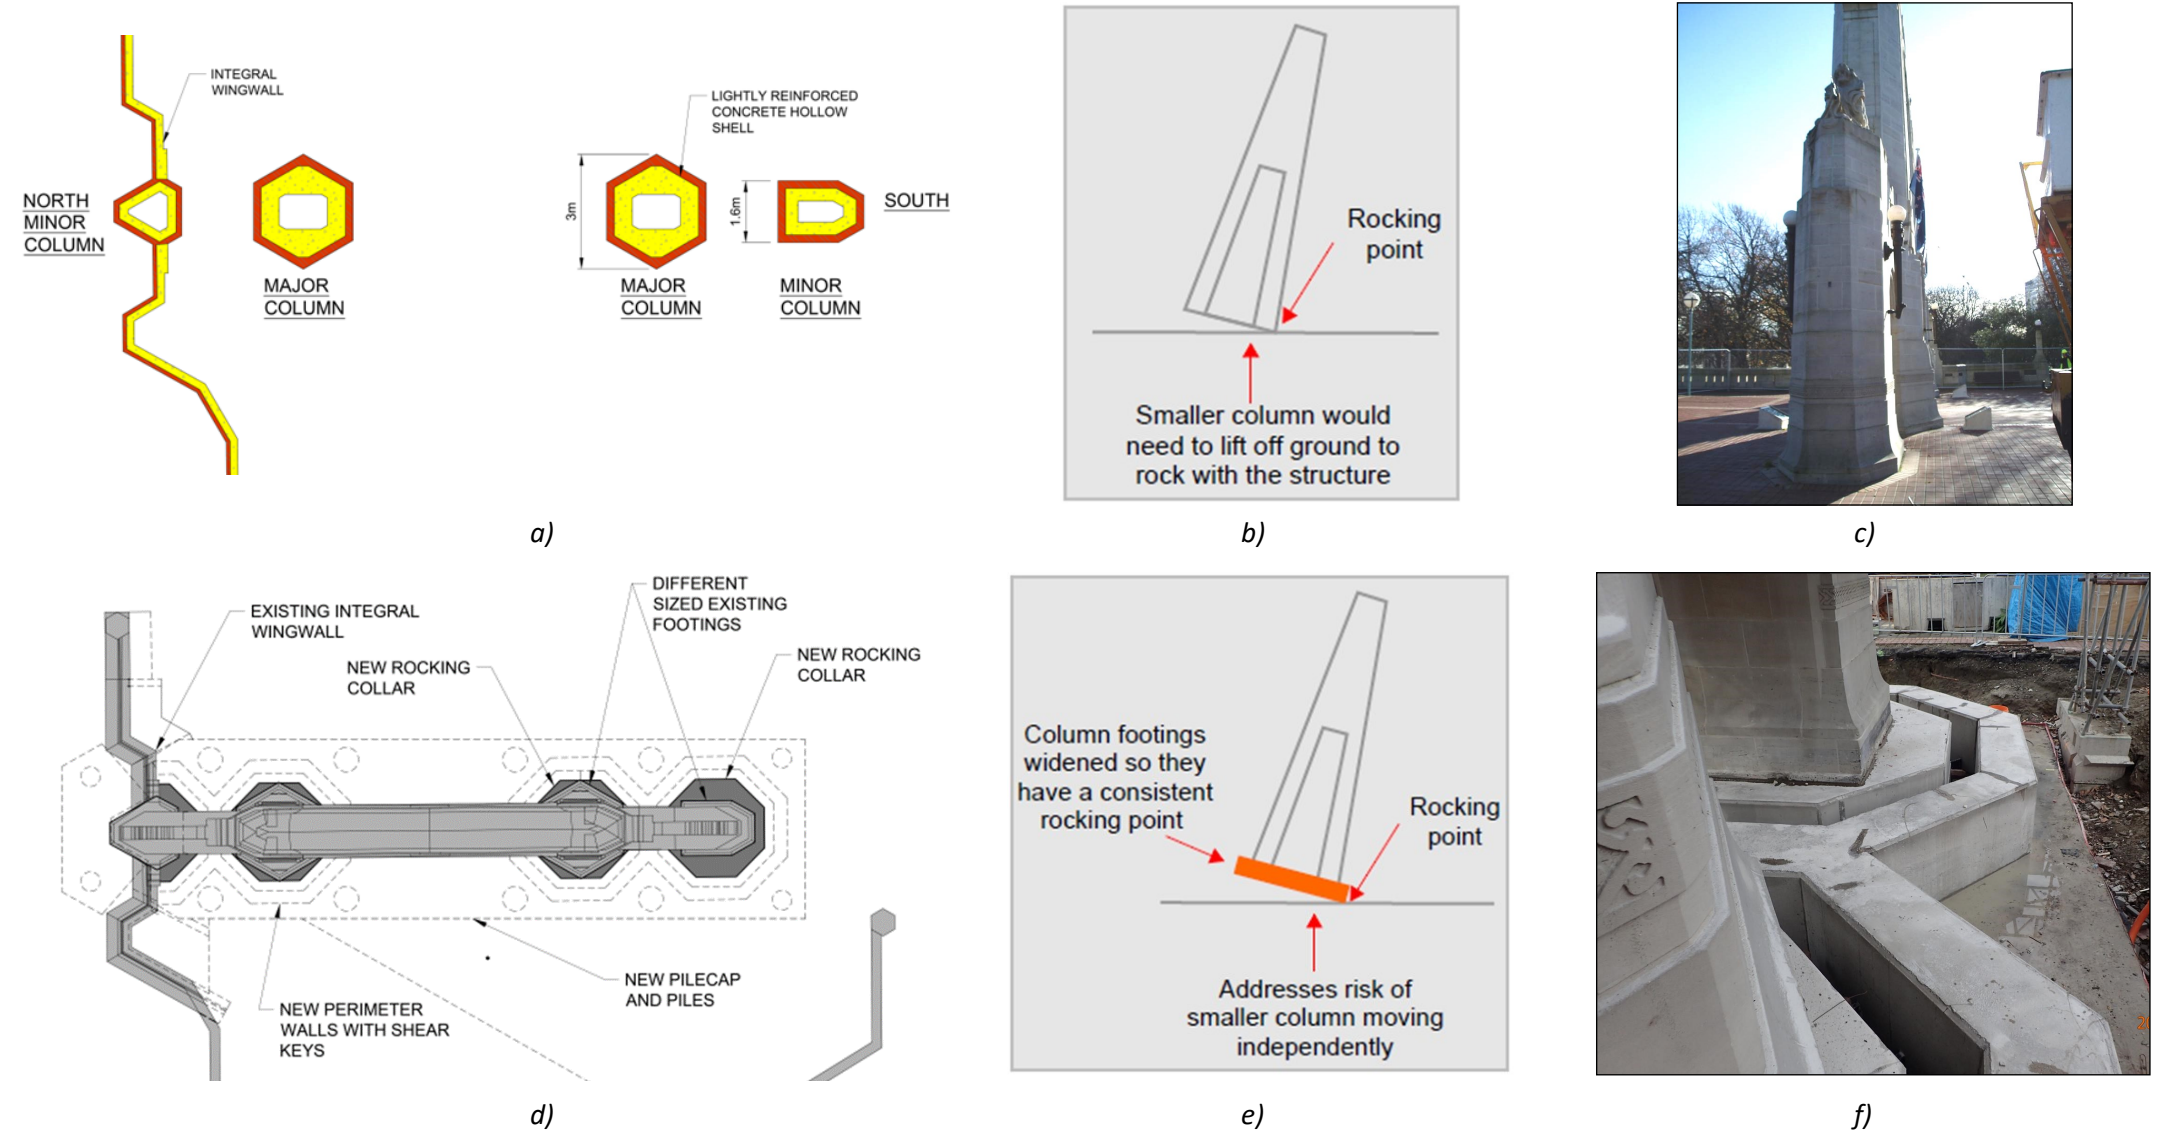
a) Plan section through existing columns indicating varying size columns and integral wingwall; b) Sketch indicating that the existing column dimensions are not compatible with rocking; c) Side elevation highlighting varying column dimensions; d) Plan on strengthened structure indicating new rocking collars which provide uniform footing dimensions compatible with rocking; e) Sketch indicating how the new collars enable rocking; f) Photo of new rocking collars with movement moat and perimeter wall on the new pilecap during construction
